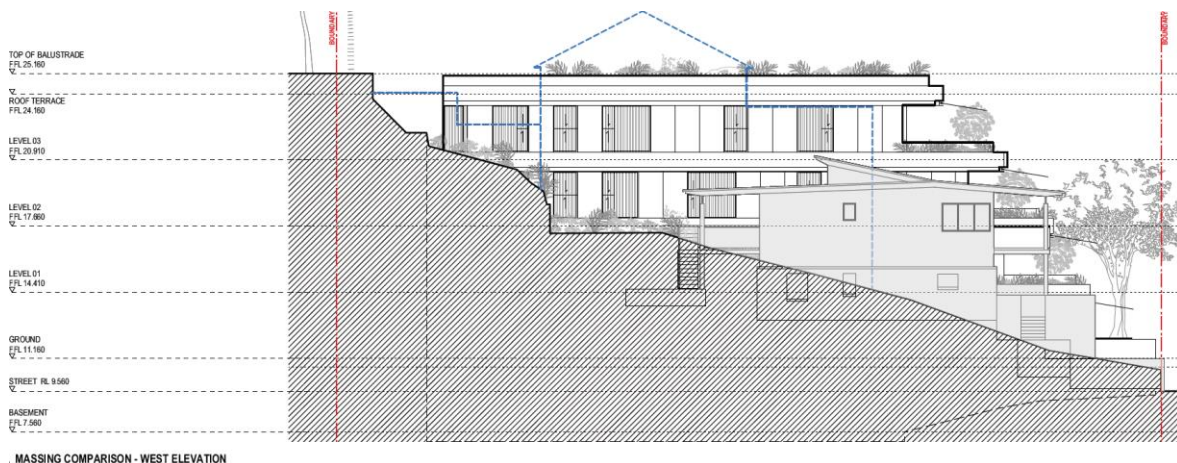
west elevation: existing, proposed and adjacent dwelling
